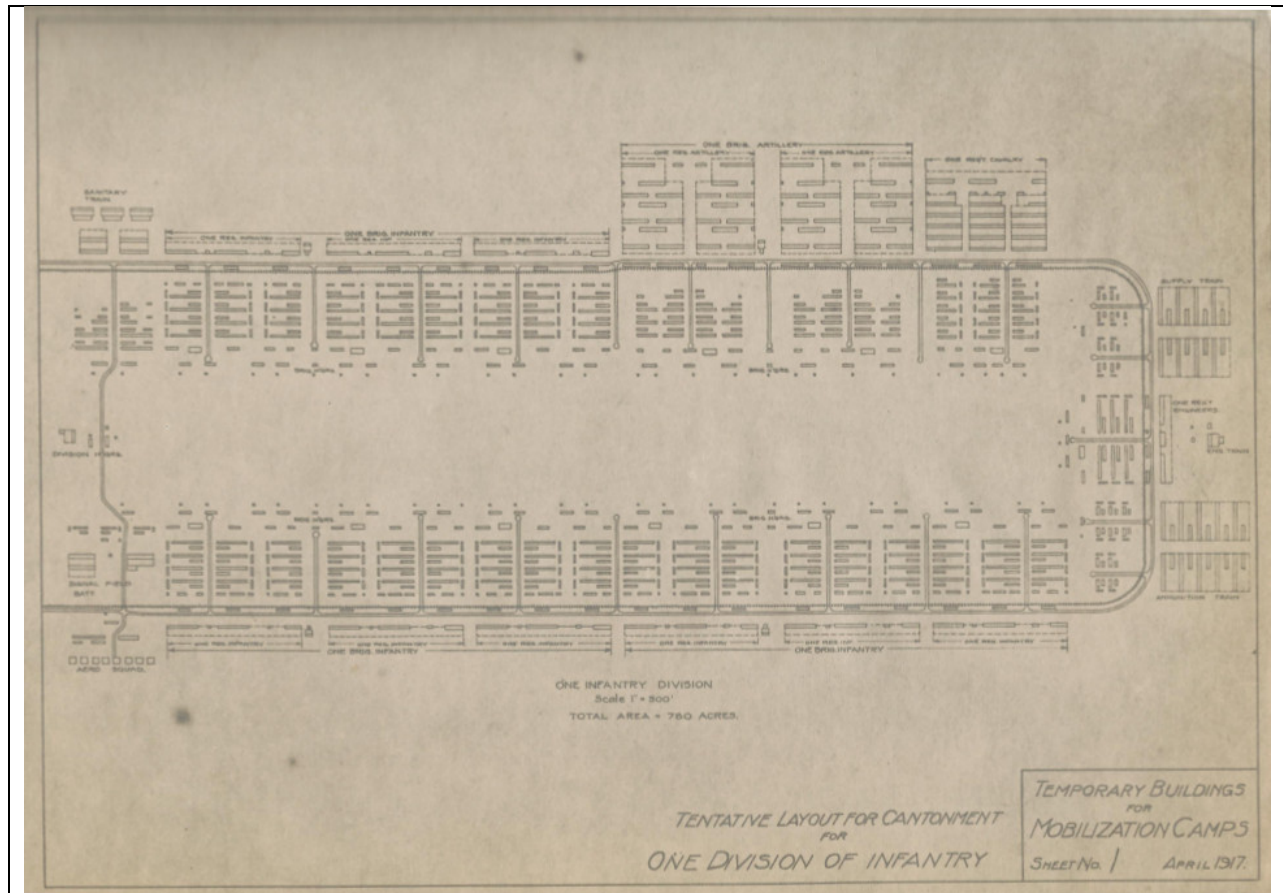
Typical Cantonment Scheme, April 1917. Published in George Gibbs, Jr., “Exhibit 2-C: Historical Statement, Section of Advisory Engineer on Camp Planning, Engineering Division, Construction Division of the Army,” Frances Loeb Library, Harvard University.
